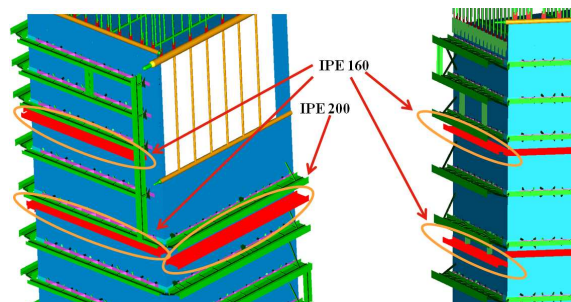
Added stiffening on convection chambers walls in areas where the resonance appeared
